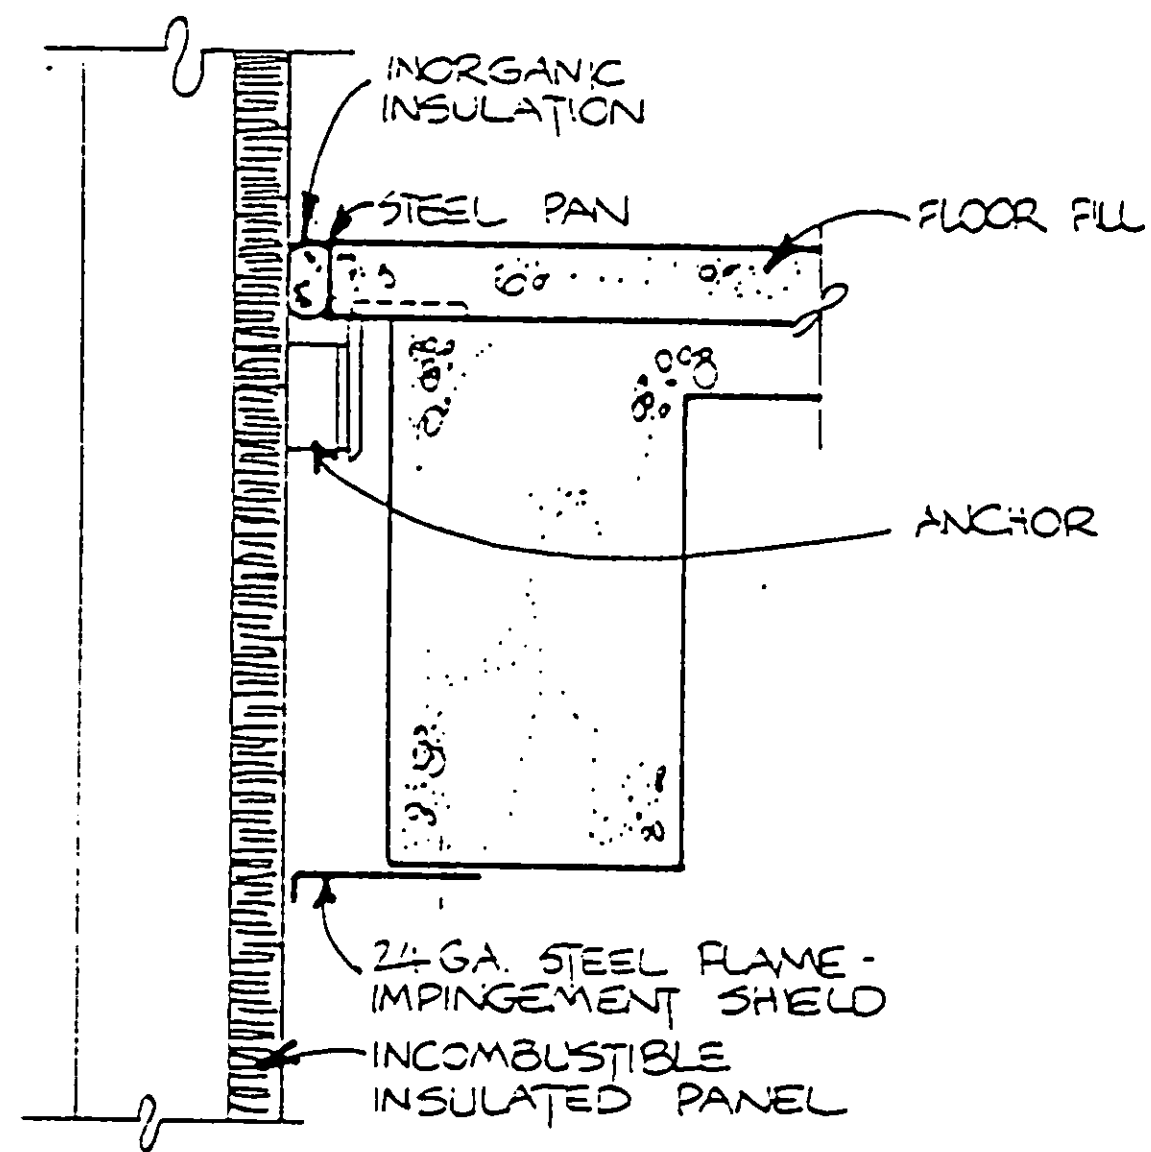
WHEN THE ANCHORS MUST BE BELOW THE FINISHED FLOOR, INSULATION MUST BE PACKED BETWEEN THE INSULATED PANEL AND THE STEEL PAN TO STOP SMOKE AND GAS. THE STEEL SHIELD WILL KEEP FLAMES OUT OF THE CONFINED SPACE BETWEEN THE PANEL AND SPANDREL BEAM.
